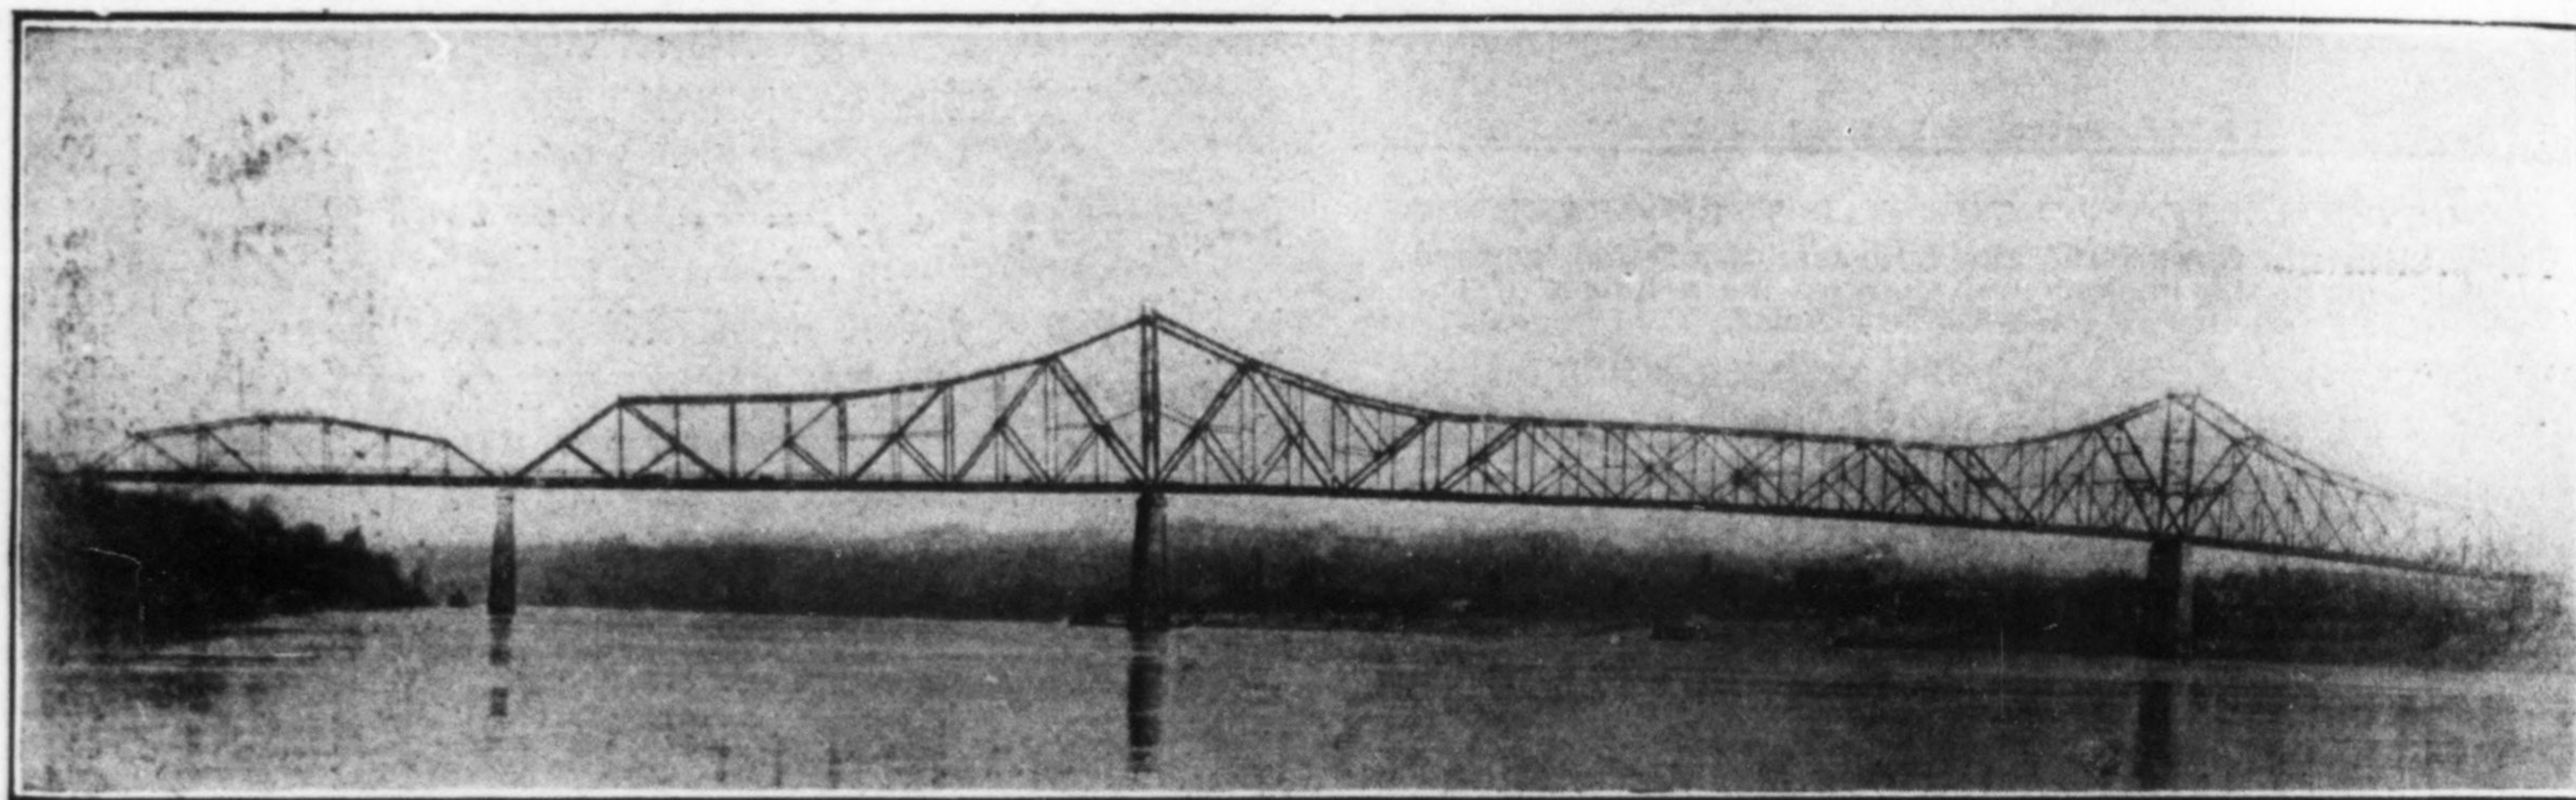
HIGHWAY BRIDGE OVER OHIO RIVER AT IRONTON, OHIO; 725-FT. CANTILEVER SPAN
